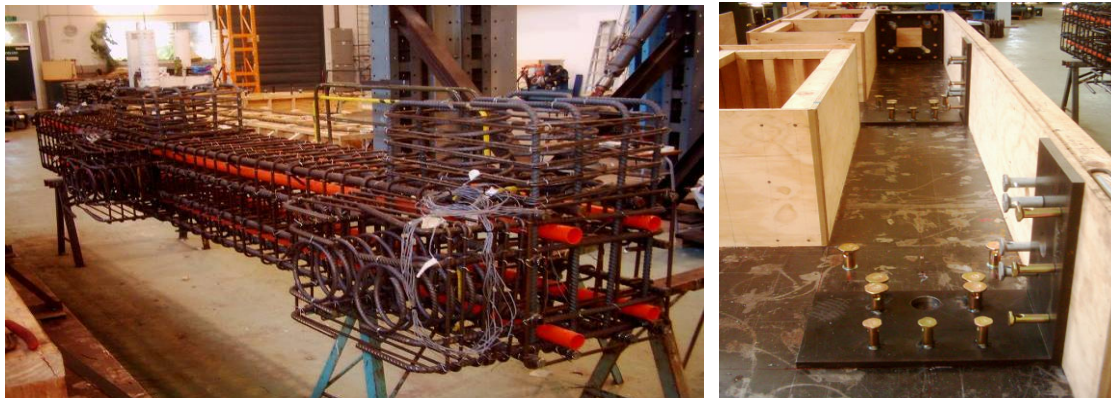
Construction process: column steel caging (left) and detailing of threaded insert locations (right).
